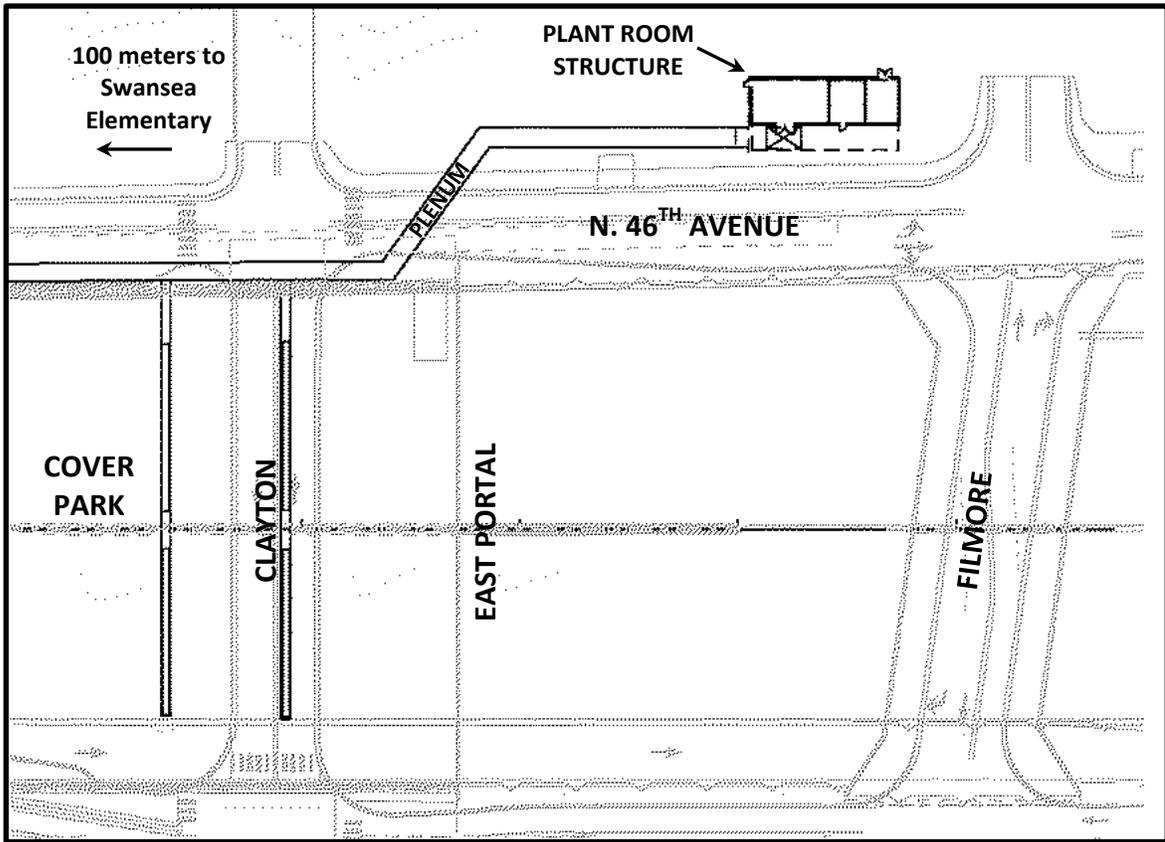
Proposed Alternate Ventilation Design (Not to Scale)
